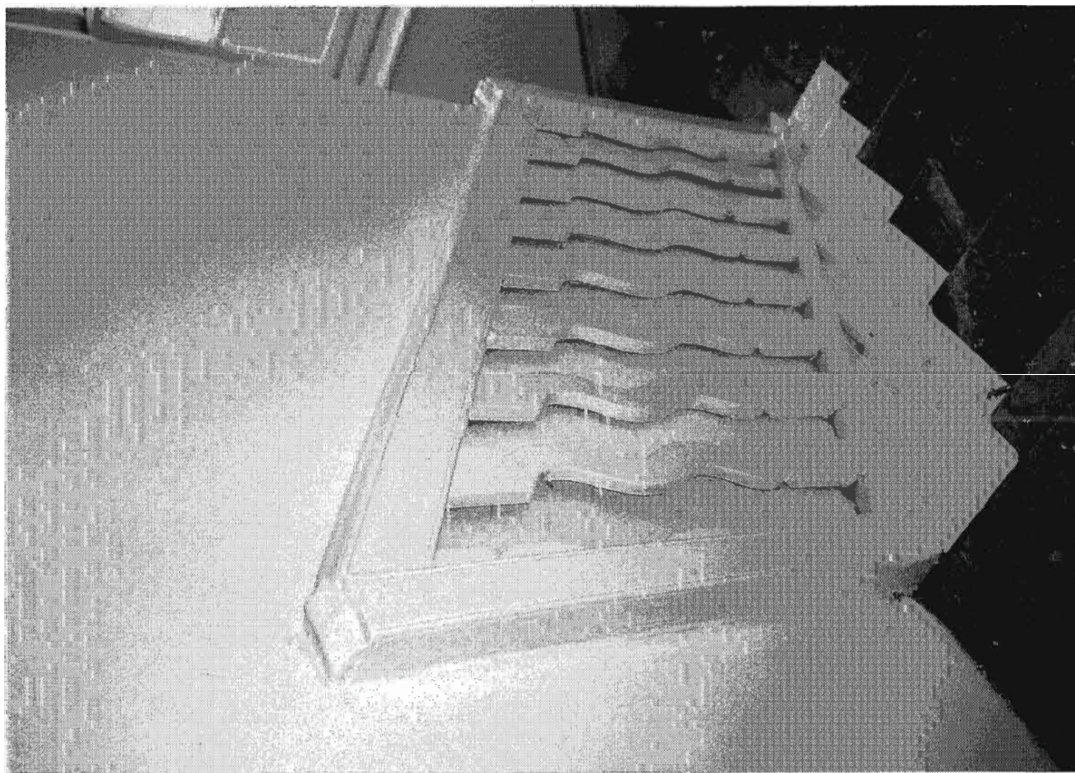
47 Market Street, staircase detail showing wavy, splat balusters moulded handrail and square newels. Stairs from first to second floor.
